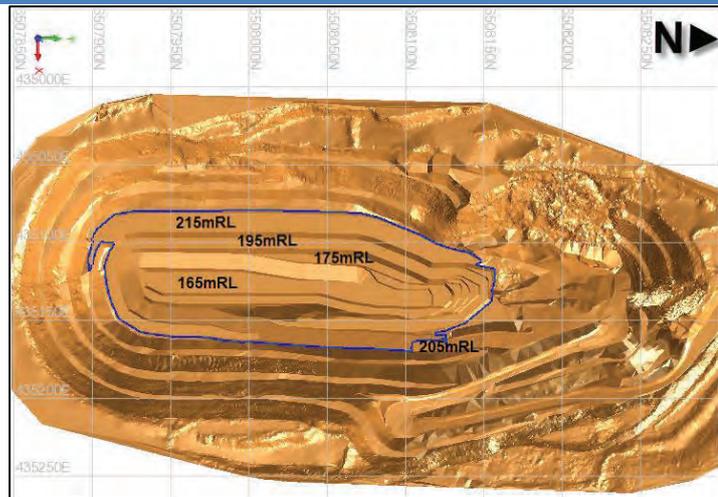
Plan view of open cut excavation design within blue “crest” line.
